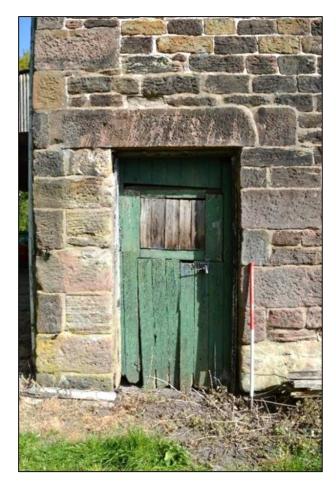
(Shot 4): Detail of south elevation of barn (Building 1), showing west door and stonework, looking north (1m scale)
